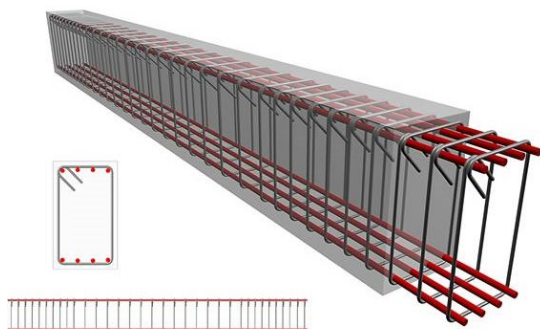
Typical reinforced concrete construction (www.buildinghow.com)
